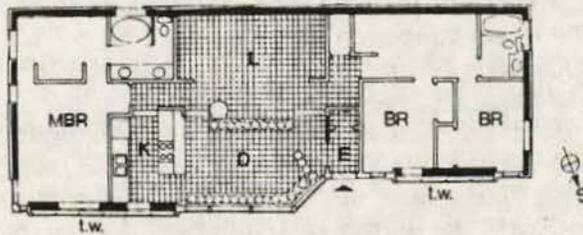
Floor Plan, MBR master bedroom, K kitchen, D dining, L living, E entry, BR bedroom, T.W. Trombe wall.
